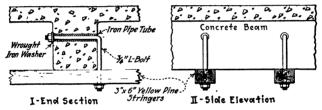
Stringers supported from concrete beam with L-bolts.
